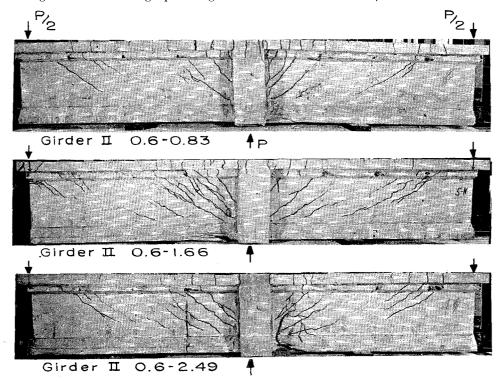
Typical Crack Patterns and Failures Group II Girders.
